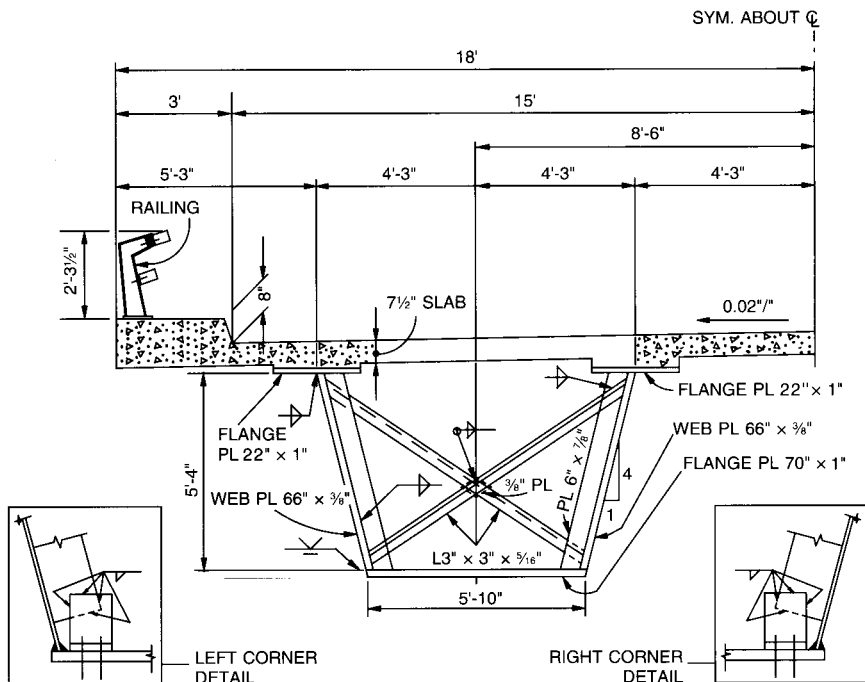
Half cross section of composite box girder with 120-ft span.
